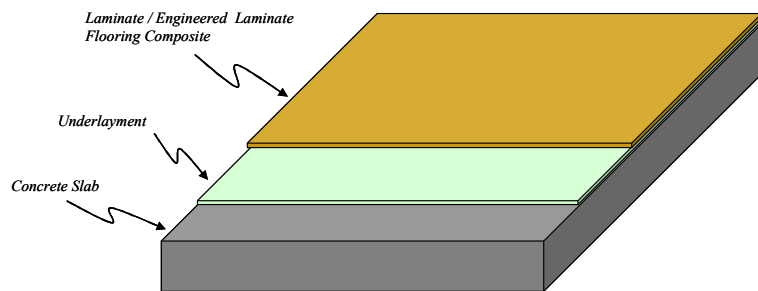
(b): Laminate and engineered flooring with underlayment on concrete slab construction.
